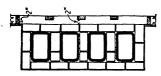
In this construction the chimney masonry is entirely free of all woodwork. Expansion and contraction of the chimney will not crack the plaster if a slip joint is made in the plaster at the intersection of chimney and wall surfaces
